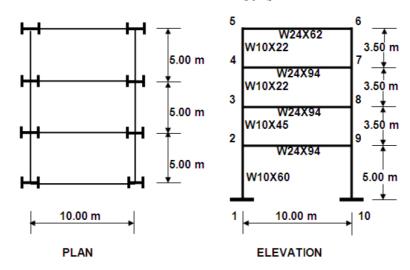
Plan and elevation of office building built with structural steel profiles
